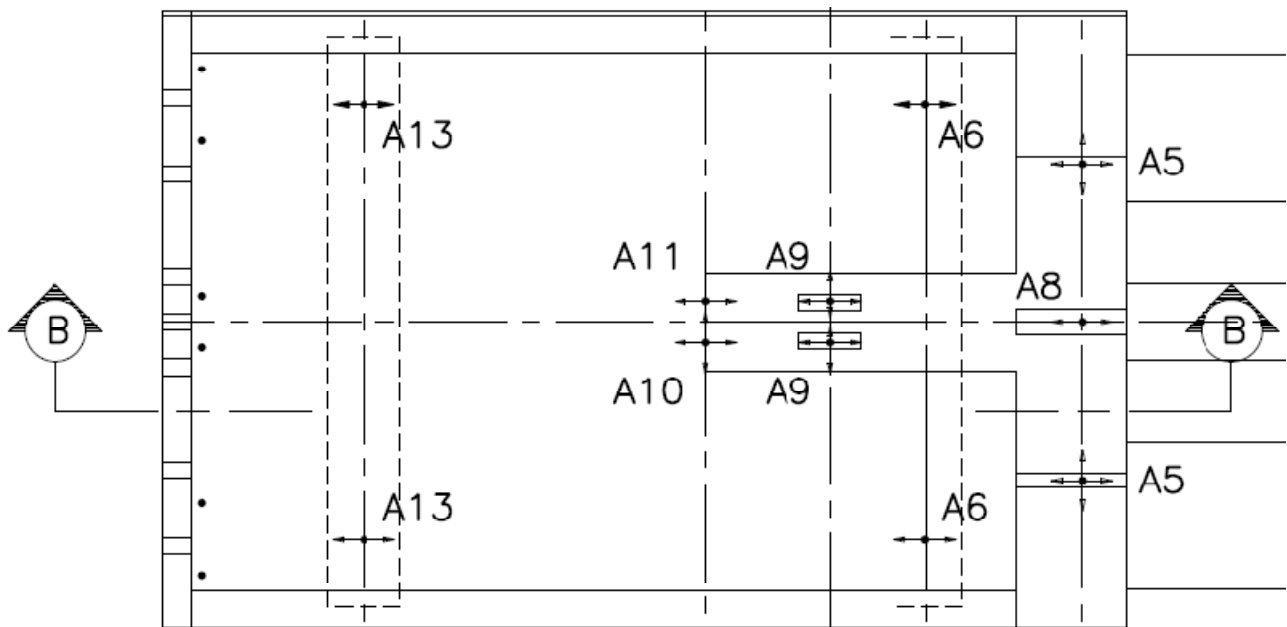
Bearing layout at terminal structure on Sicilia side
